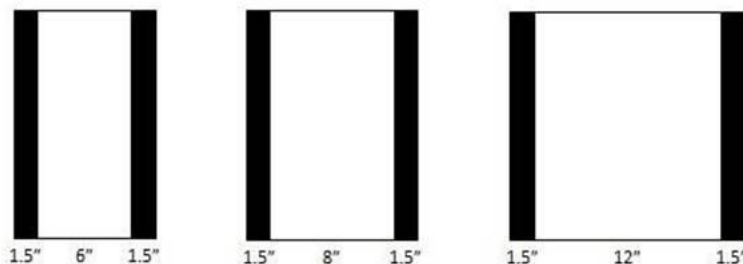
CPM-2 Contrast Pavement Marking, One-Pass Application
